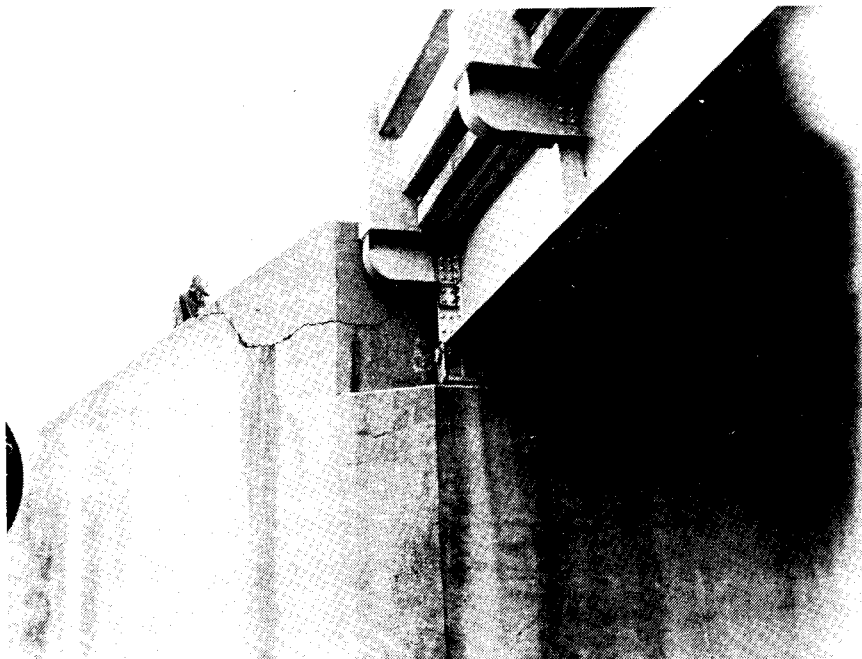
UPPER PORTION OF BACK WALL SHEARED BY EXPANSION OF BRIDGE DECK
